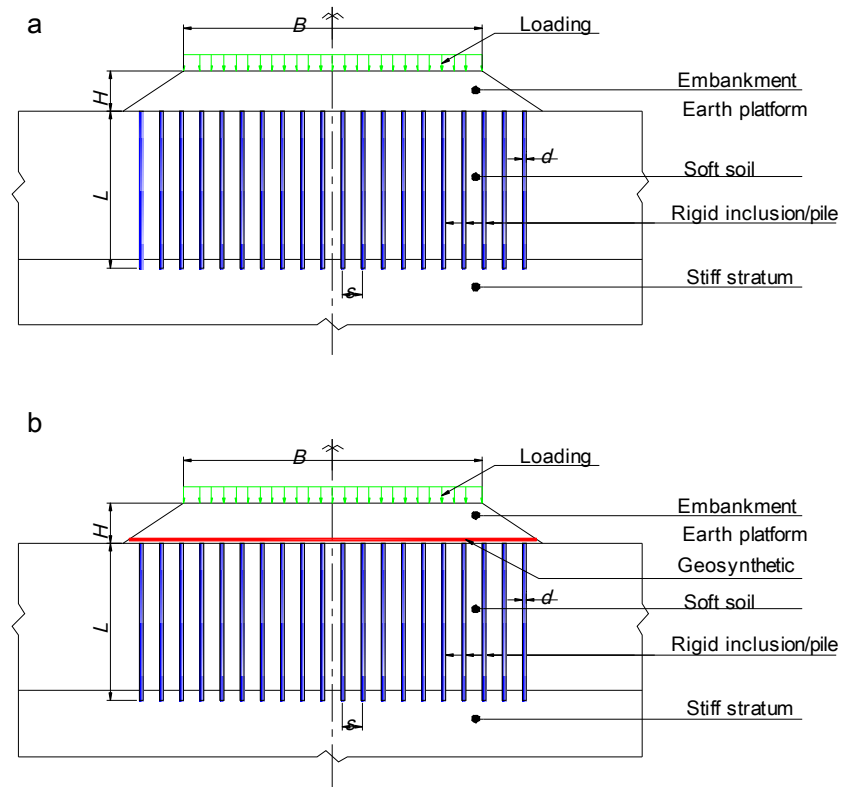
Detail of the systems: a) Piled embankment; b) GRPS embankment
